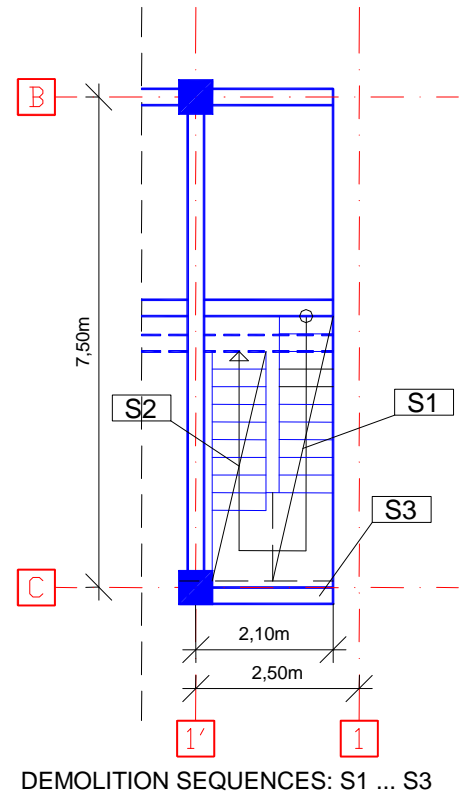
Demolition of staircase at 2<sup>nd</sup> storey.
